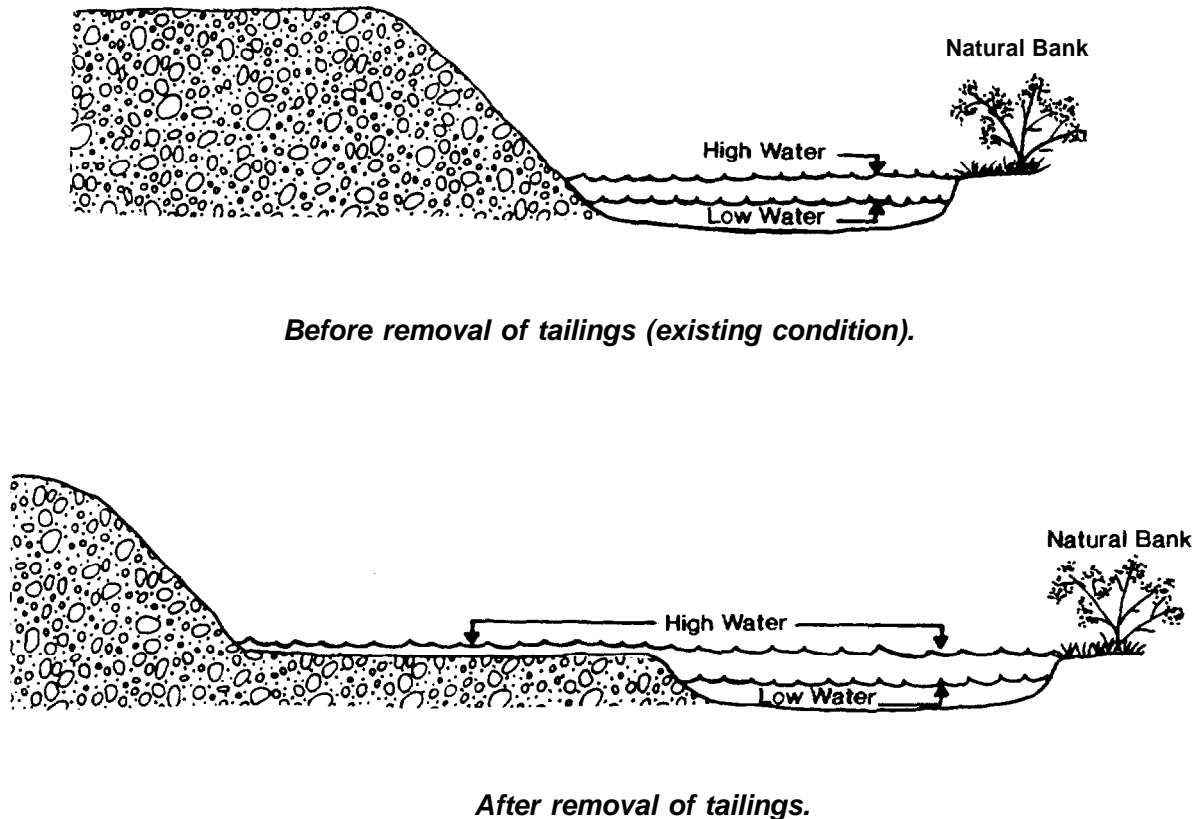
Cross-section of flood plain constructed by removal of dredge tailings adjacent to the stream channel.
